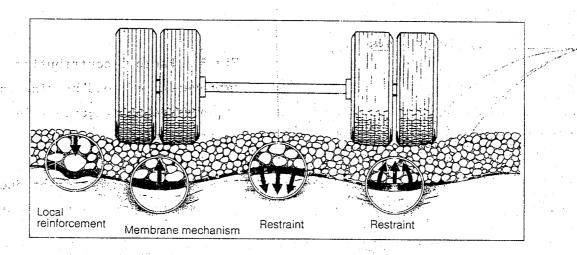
Three distinct mechanisms by which geotextile reinforces an aggregate-fabric-subgrade system
